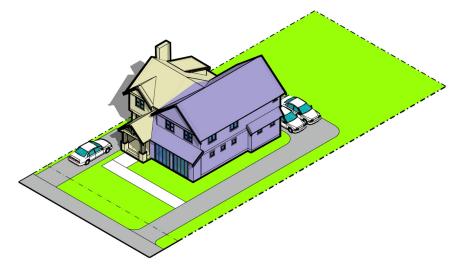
Principle residence and Internal Accessory Dwelling Unit Example
